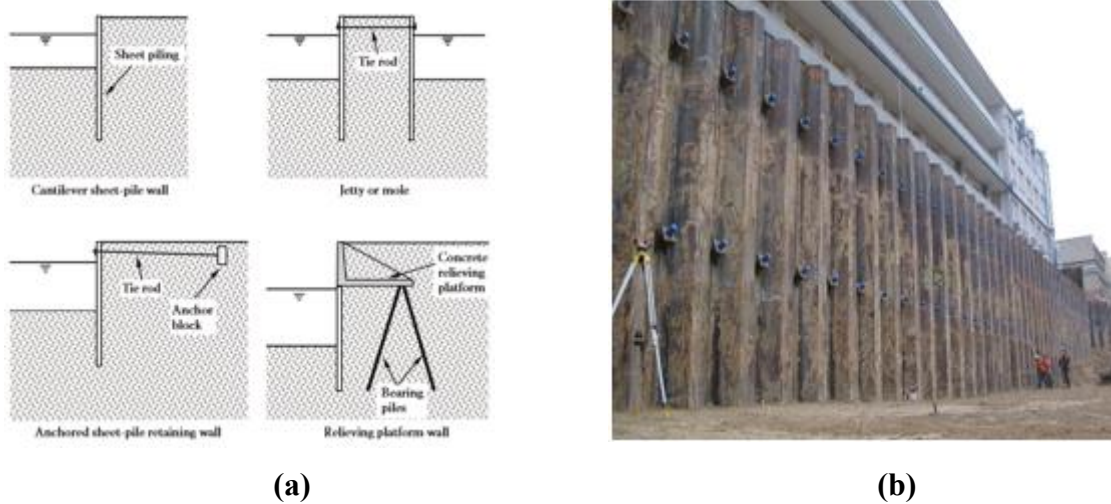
Sheet pile walls (a) Cross sections through some typical Permanent sheet-pile structures. (Clayton et al., 2020) (b) Typical sheet pile wall (www.constrofacilitator.com)
